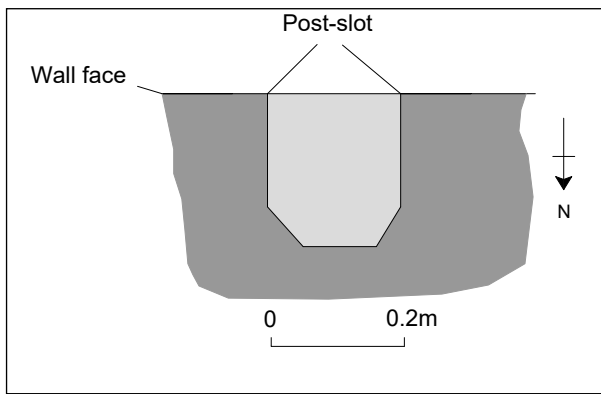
Fenton Hill: plan view of post-slot 114, showing chamfered corners
